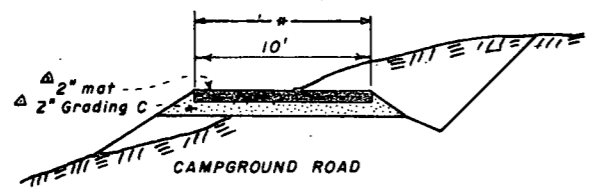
DETAILS OF AMPHITHEATER ROAD AND CAMPGROUND
